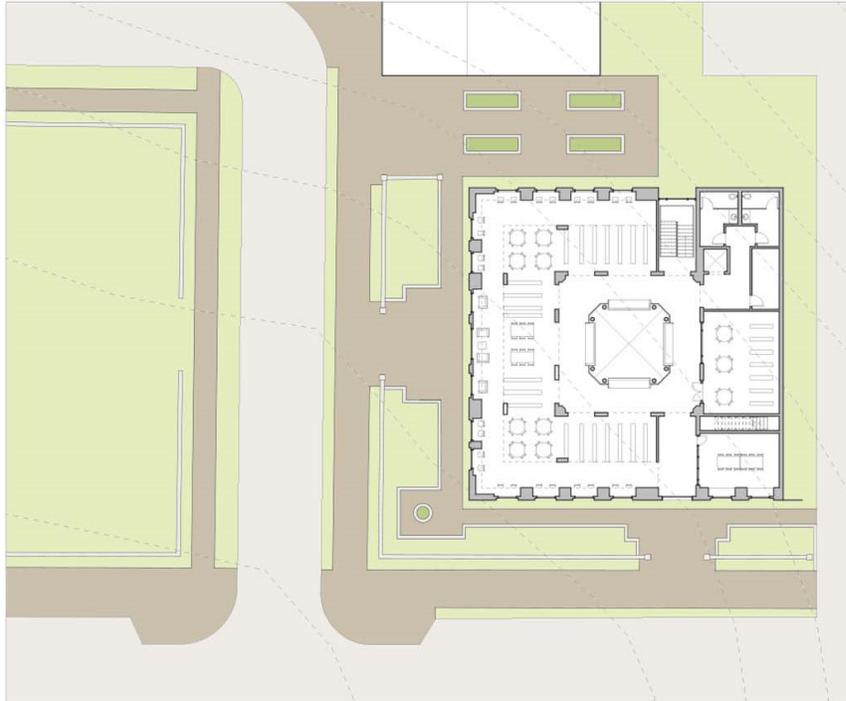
Cumberland, MD – Second Floor Plan, Source- Author, 2014
